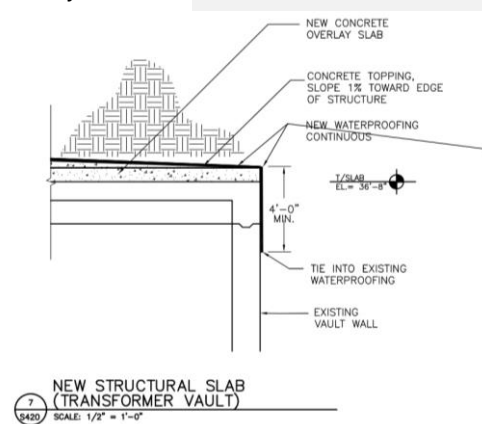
Transformer vault section showing the new waterproofing to tie in with the existing waterproofing at the exterior wall¹².
